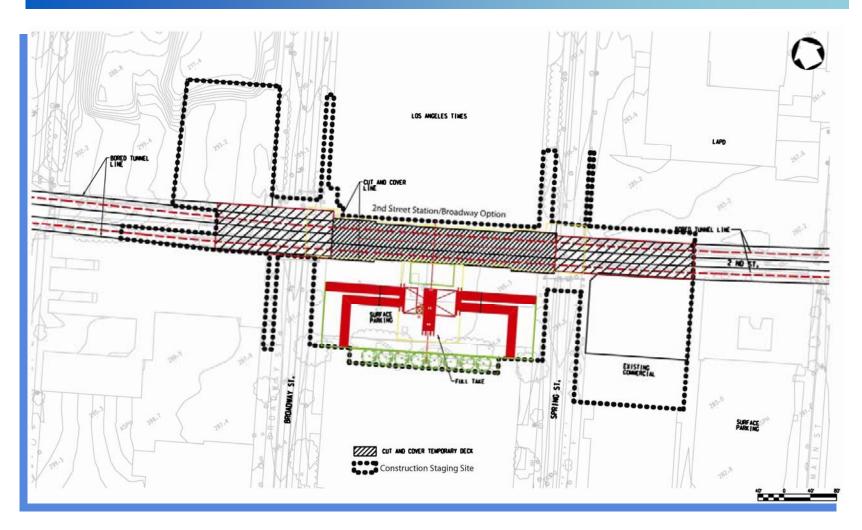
2<sup>nd</sup>/Broadway Station (Underground Emphasis LRT Alternative – Broadway Station Option and Fully Underground LRT Alternative)
